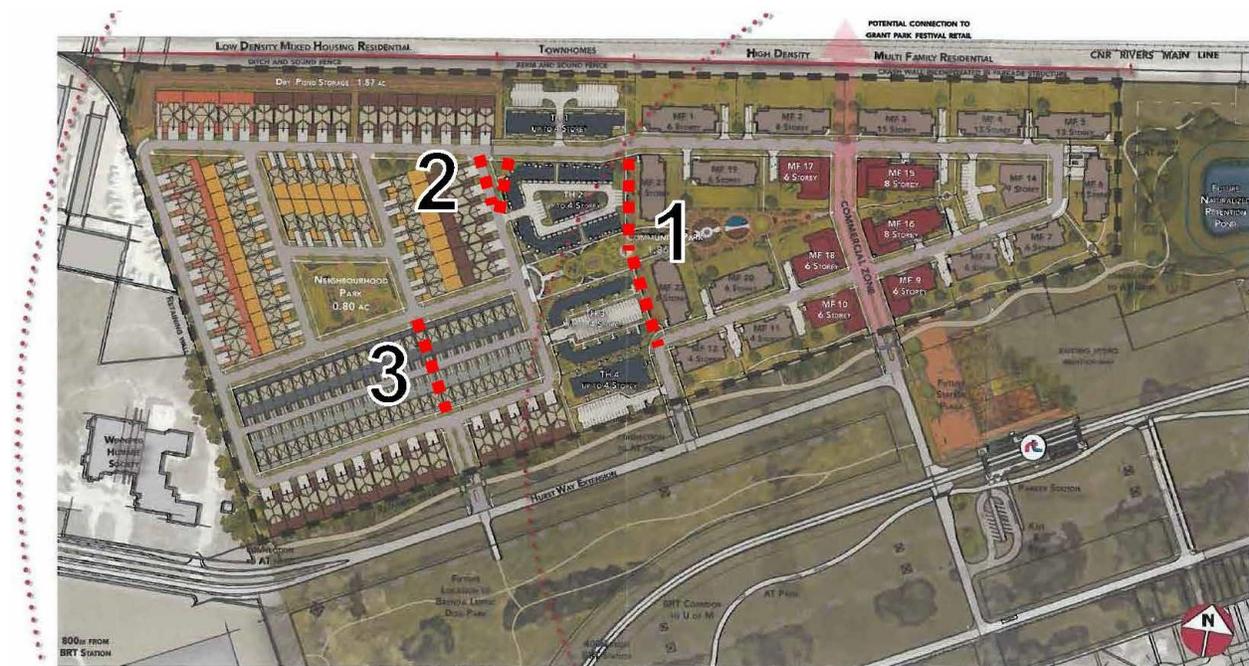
DASZ Plan showing 3 key changes to the proposed internal road network submitted by the Applicant October 29, 2018.
